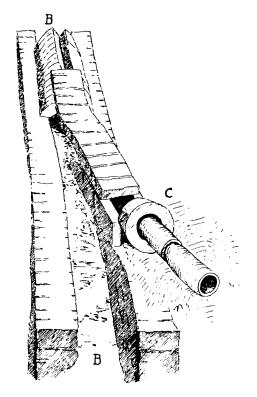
Discharge of Late Roman Conduit C into Conduit B, Looking Southeast
